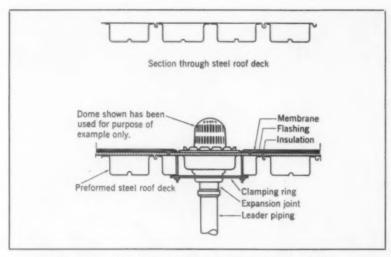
Typical installation of roof drain in preformed steel roof decking
